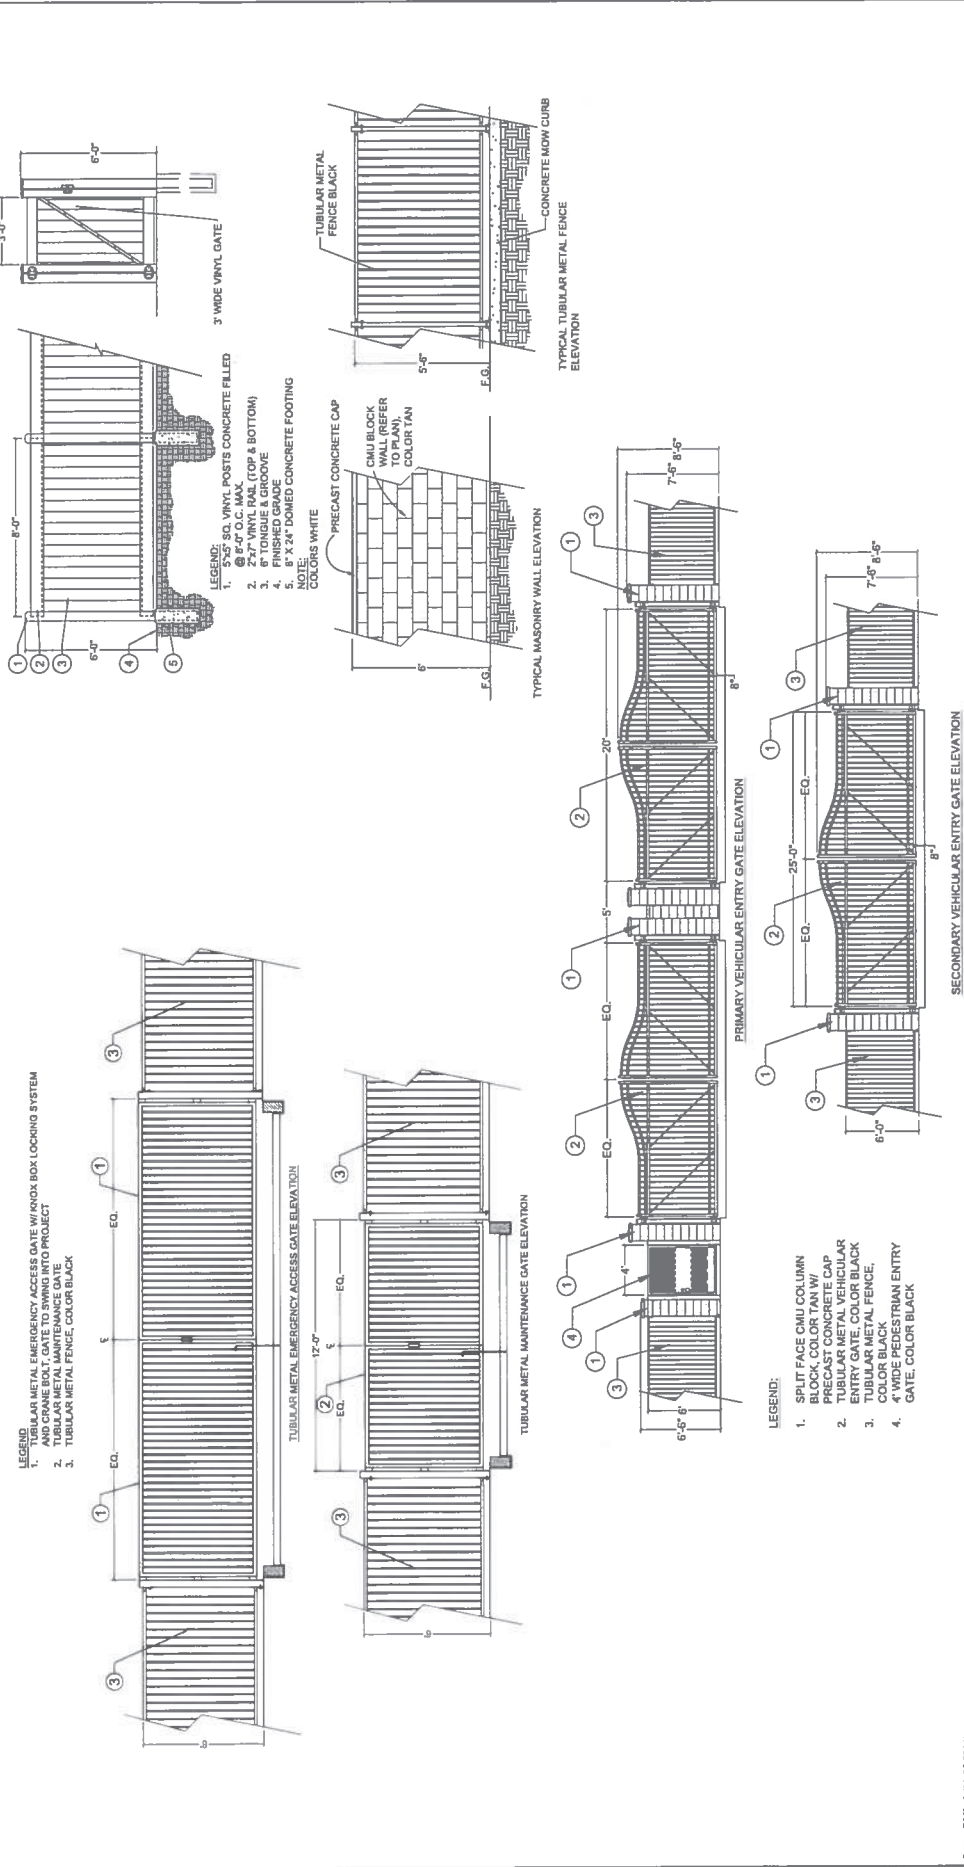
WALL AND FENCE DETAILS Page IV-11
